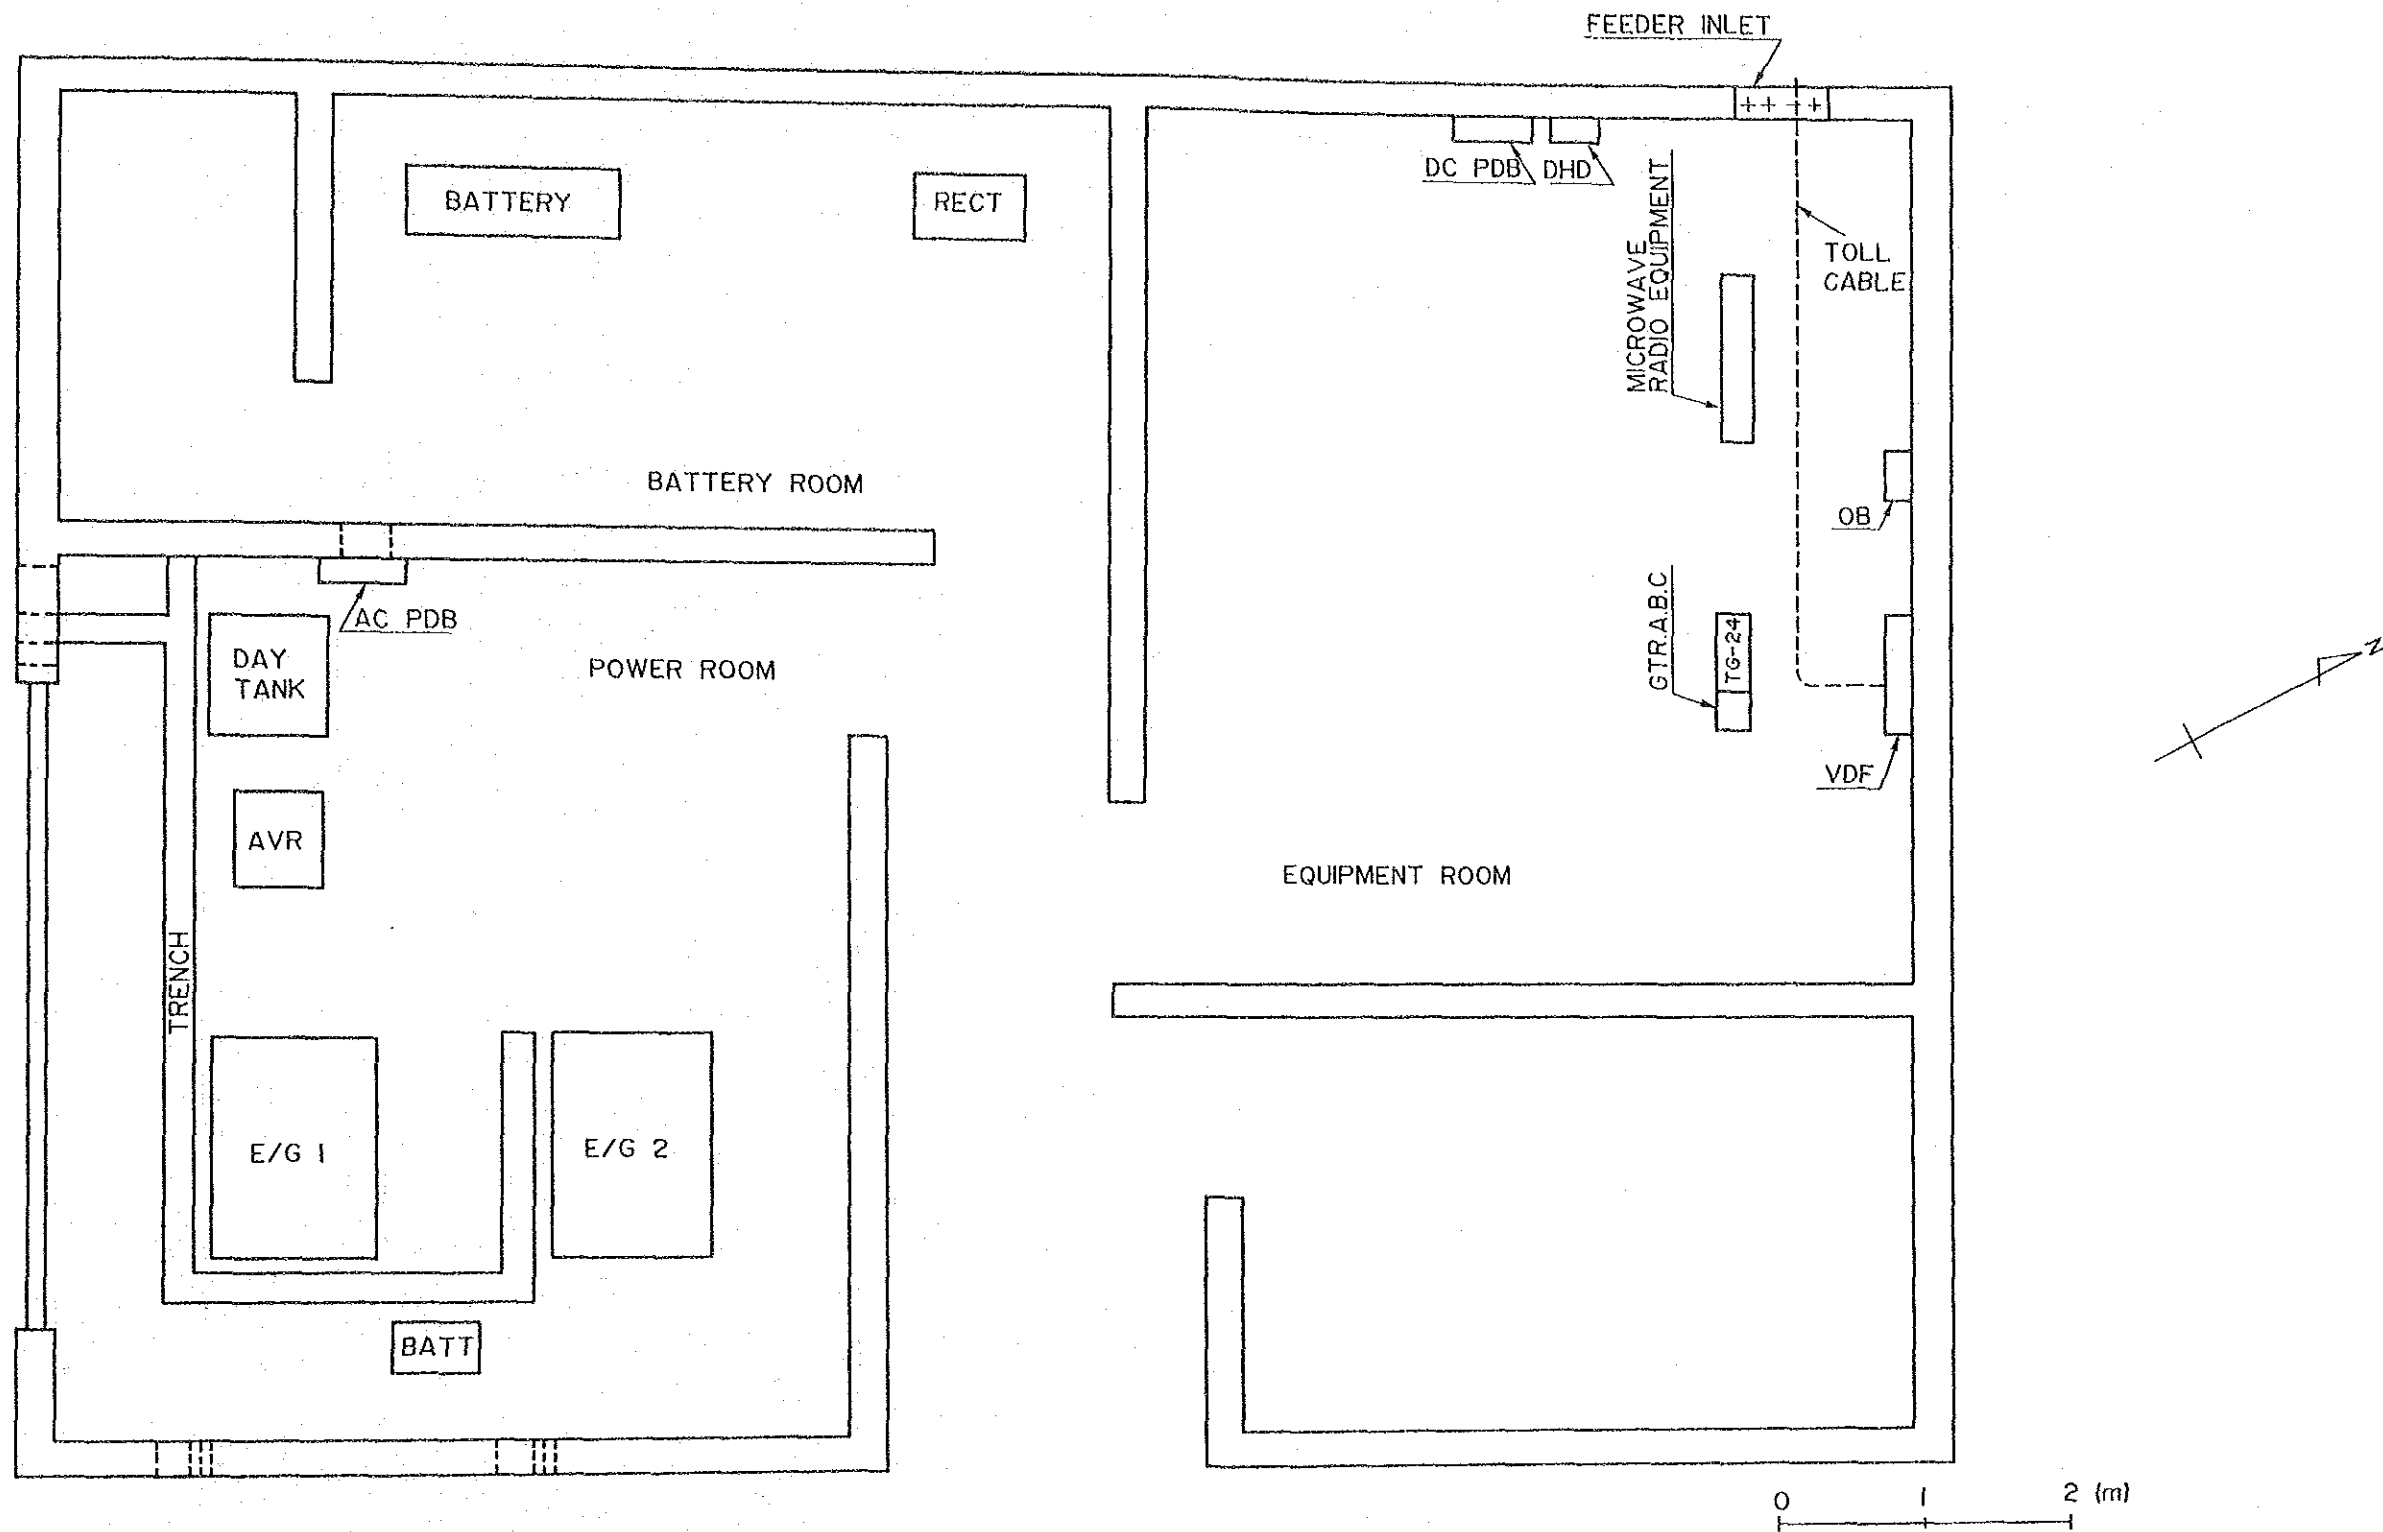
Floor Layout at Yenangyaung Microwave Station
